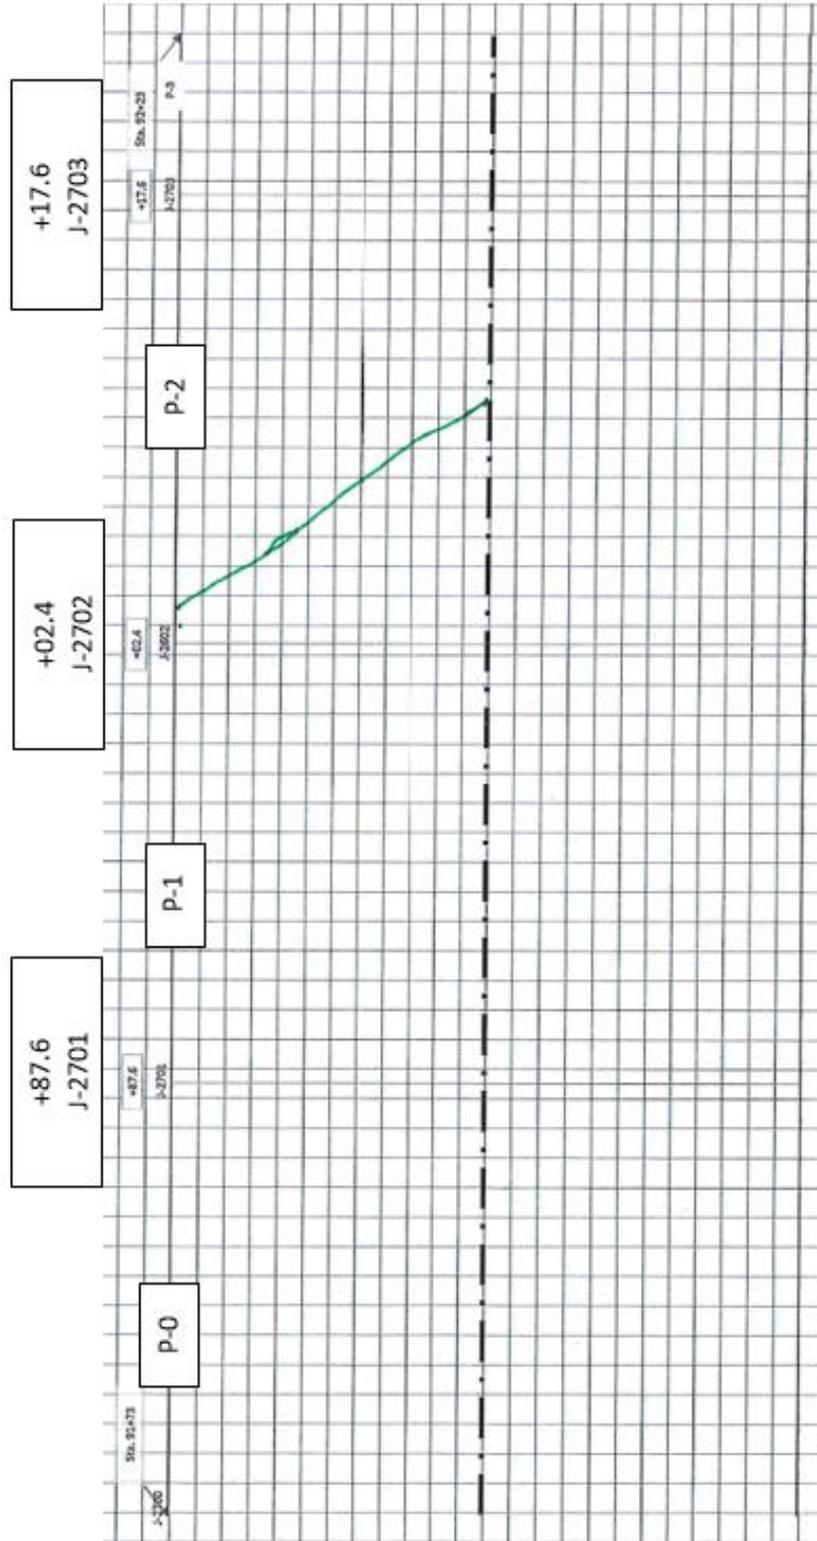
Schematic plan view of the cracking occurred on inside lane at cell 138
